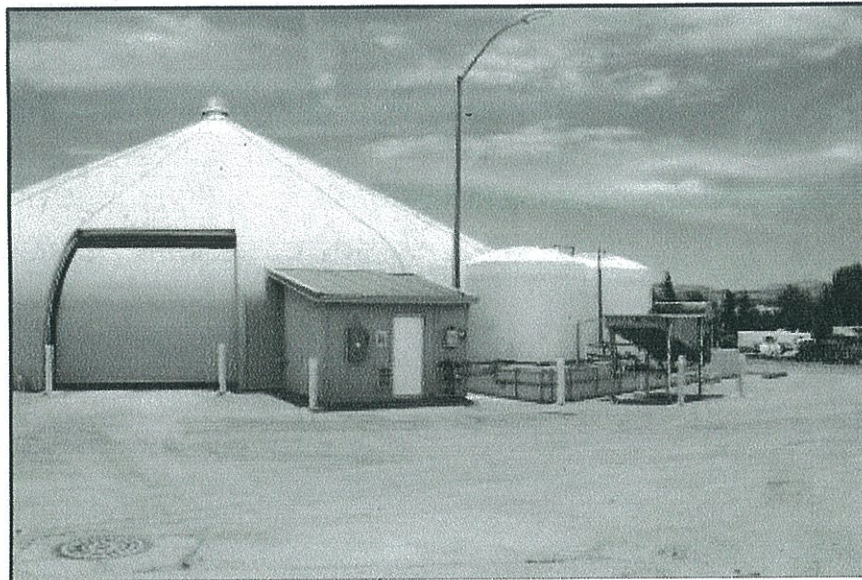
This is a picture of the City of Reno’s salt/sand mixture for snow removal. Containers of brine are located outside the building and are enclosed with secondary containment to prevent spills from leaving the site.
